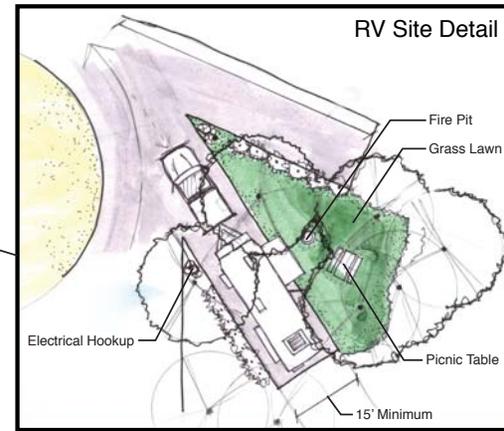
TRAMWAY PARK CONCEPTUAL SITE PLAN
